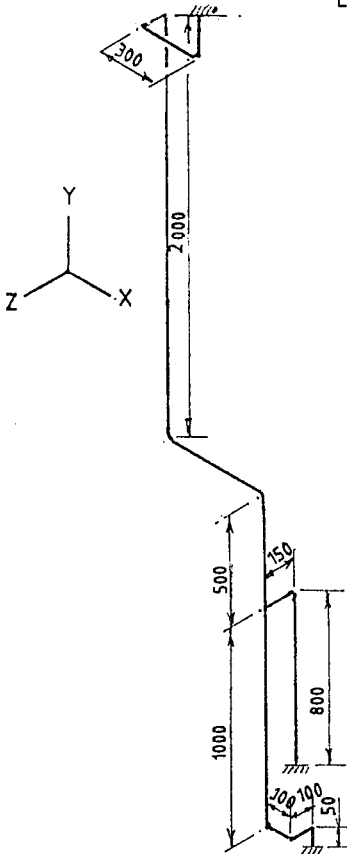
HEADER PRESSURE CONTROL TUBING LAYOUT -2
